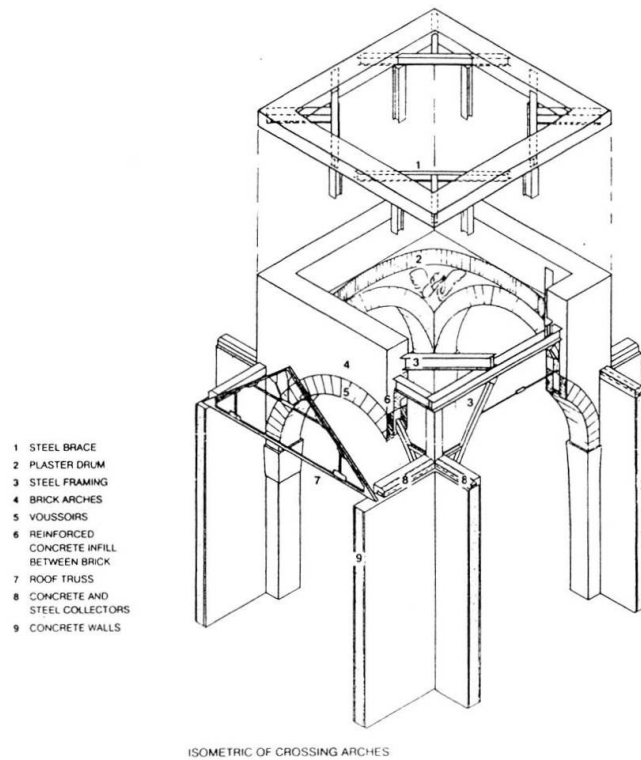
Isometric of strengthening of the Crossing Arches of Stanford Memorial Church.
